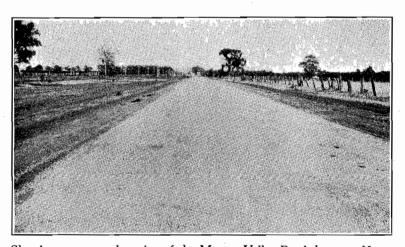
Showing constructed section of the Murray Valley Road, between Kerang and Cohuna.
